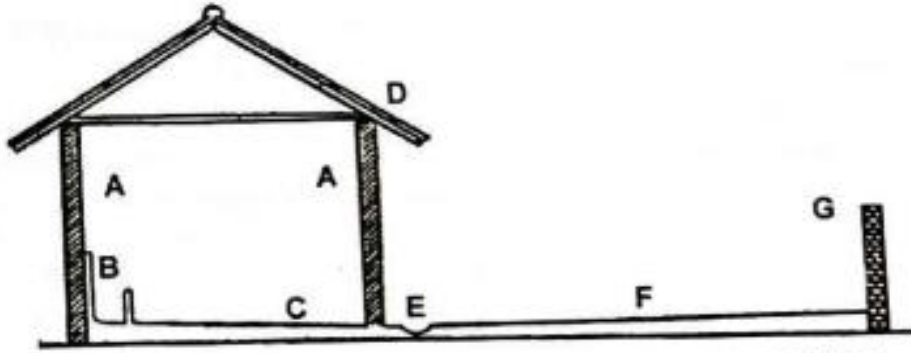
SECTION OF A LOOSE HOUSE SHOWING INTERNAL DETAILS
